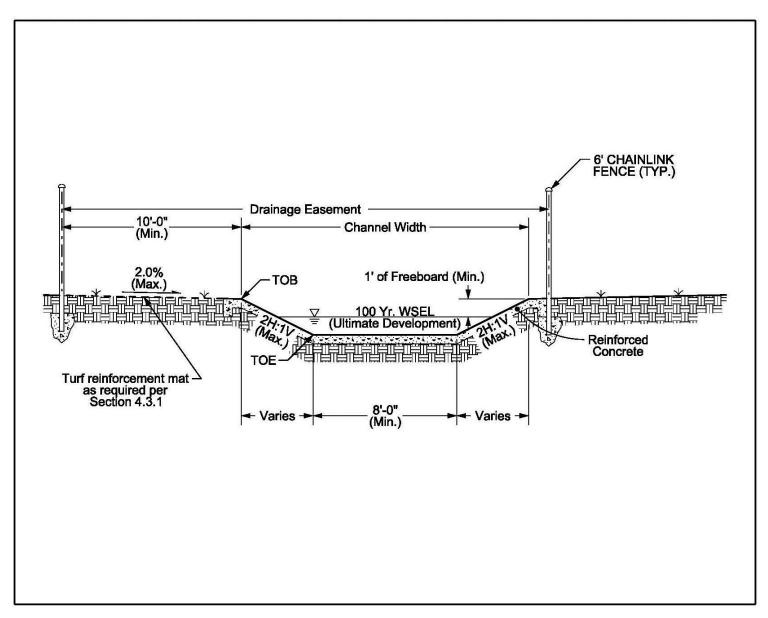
Section View - Trapezoidal Concrete Lined Channel
